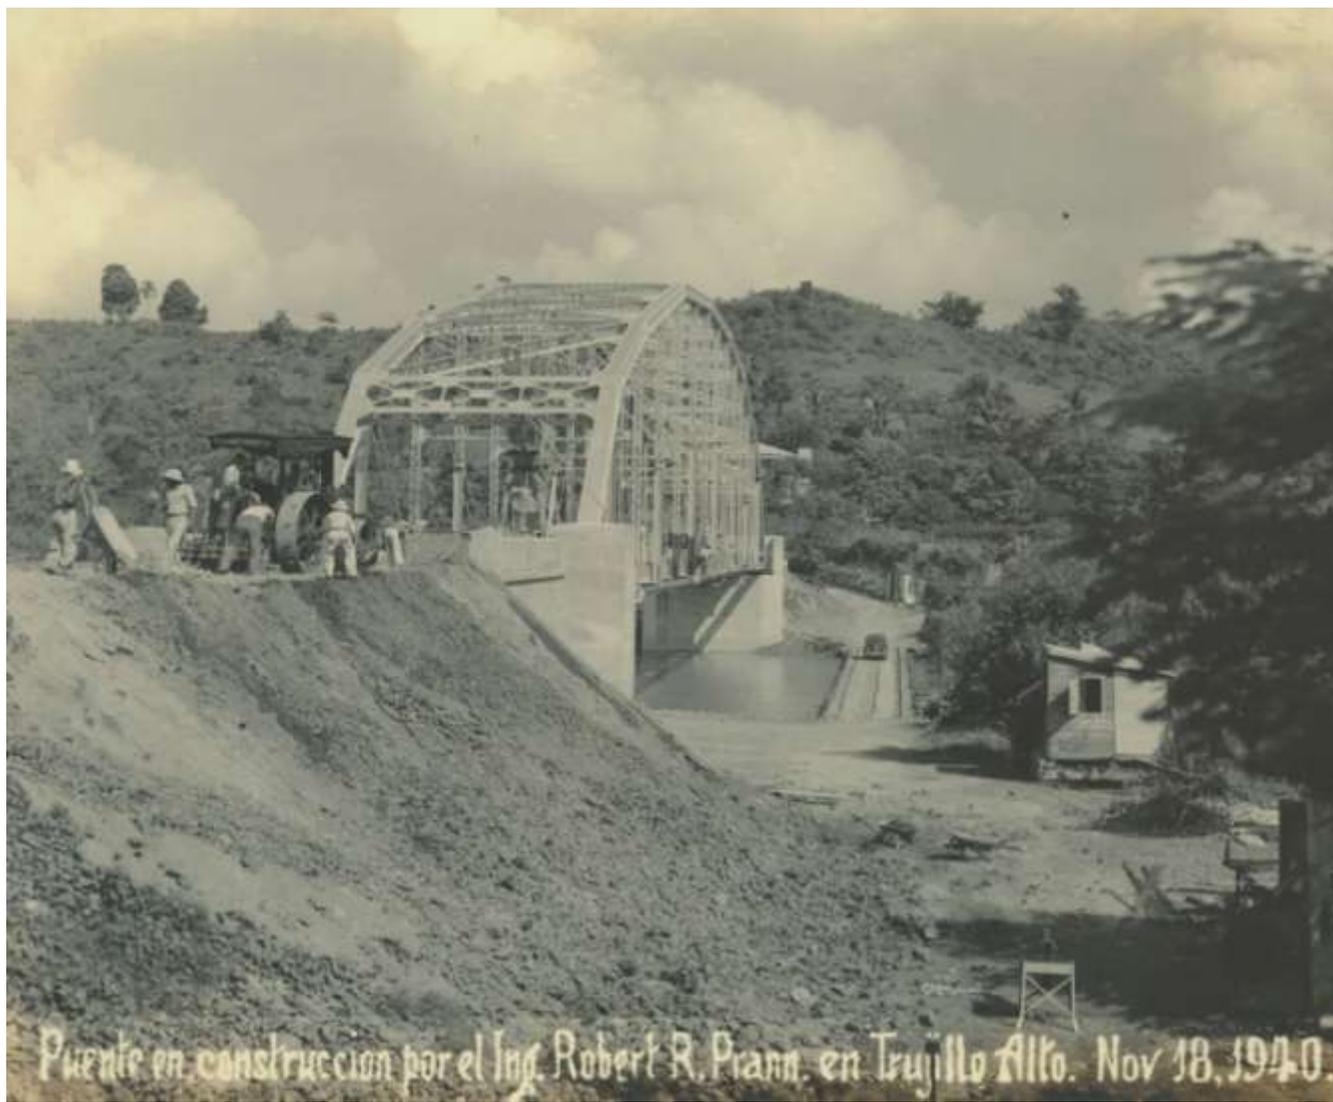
View of the bridge's western side prior to completion, November 18, 1940. A car crossing the provisional bridge can be observed. Robert R. Prann Collection, Trujillo Alto Bridge, 1939, Contract 120, Archive of Architecture and Construction. University of Puerto Rico.
